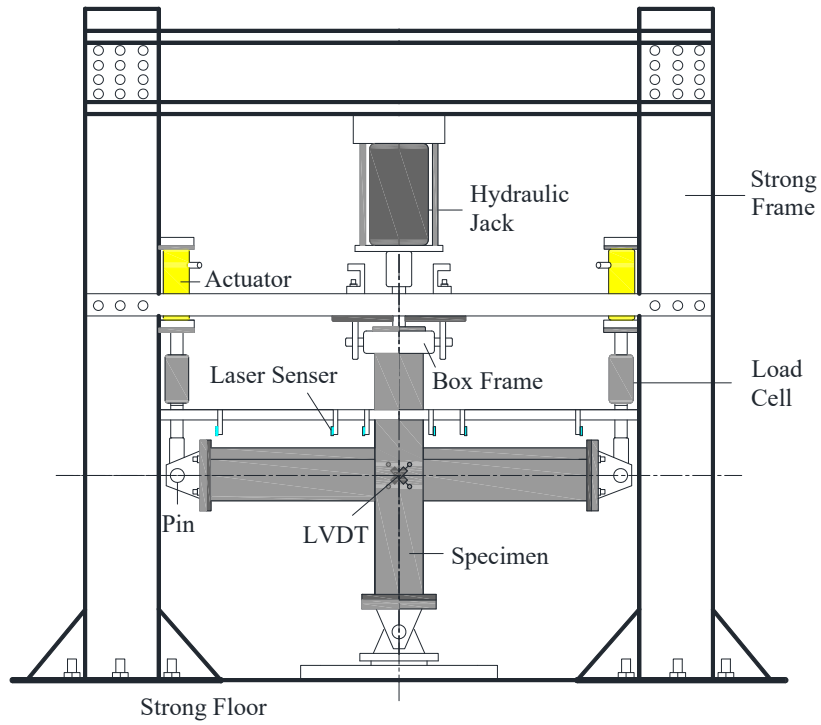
Typical test setup of RC joints with cast-in-place floor slabs
